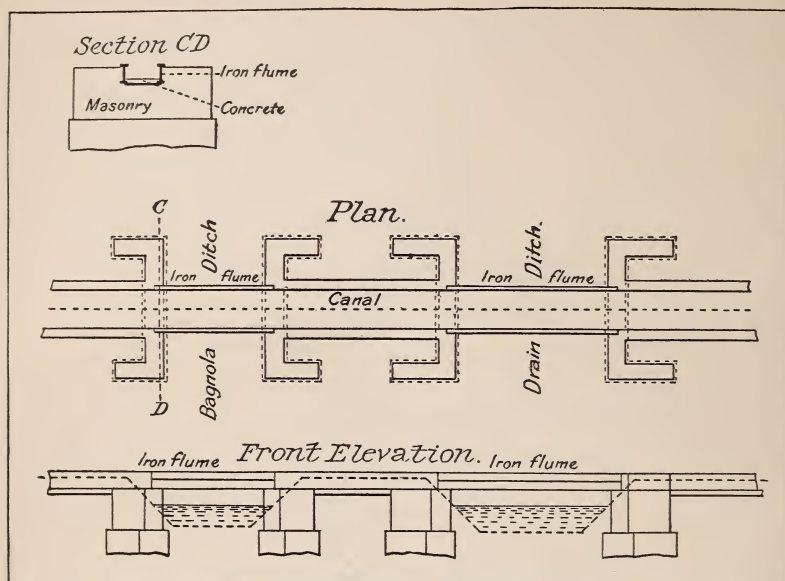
Branch of Vettabbia Canal passing over an irrigation and a drainage ditch.
